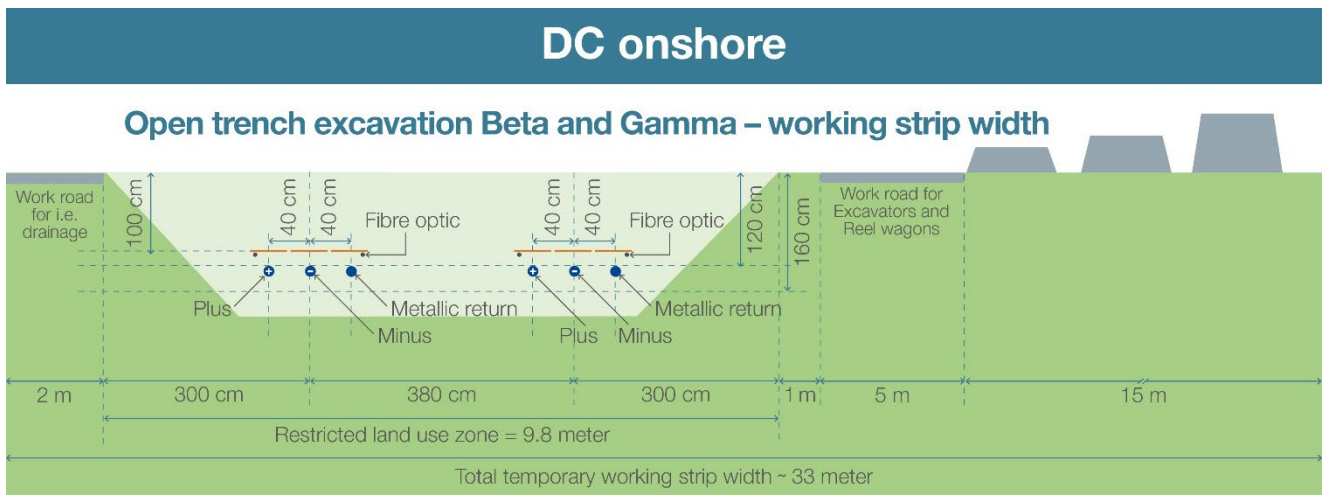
Typical example working area for trench type 525 kV HVDC connection
